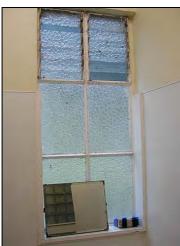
External window in S7. Note Arctic glass panes and louvres.
